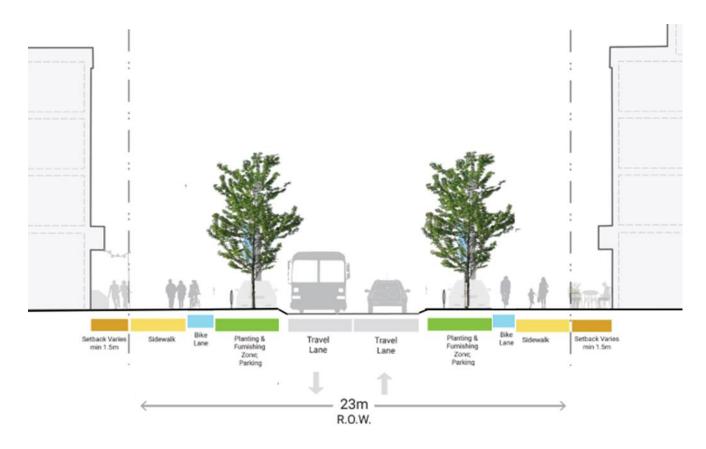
DRAFT alternative Collector Road Cross-Section (23 metres)
